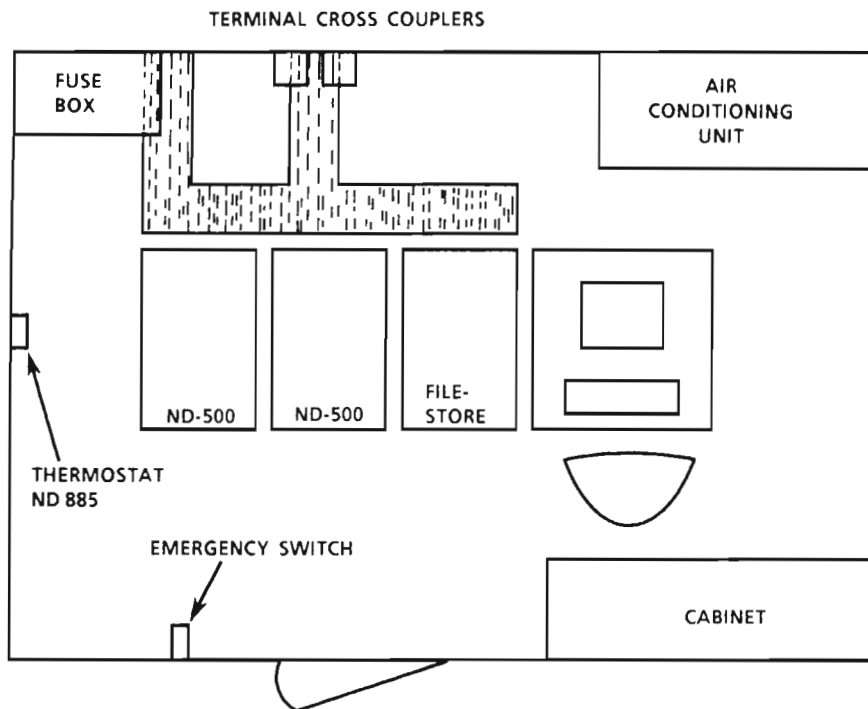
In computer rooms with a single floor, all cables must be run in cable ducts.
